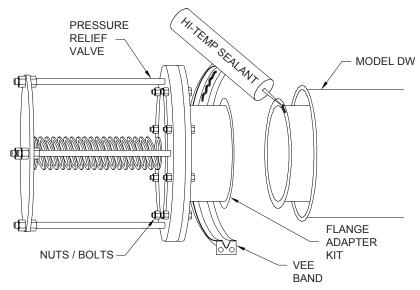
PLATE SUPPORT ASSEMBLY MAY BE USED IN LIEU OF A VEE BAND
